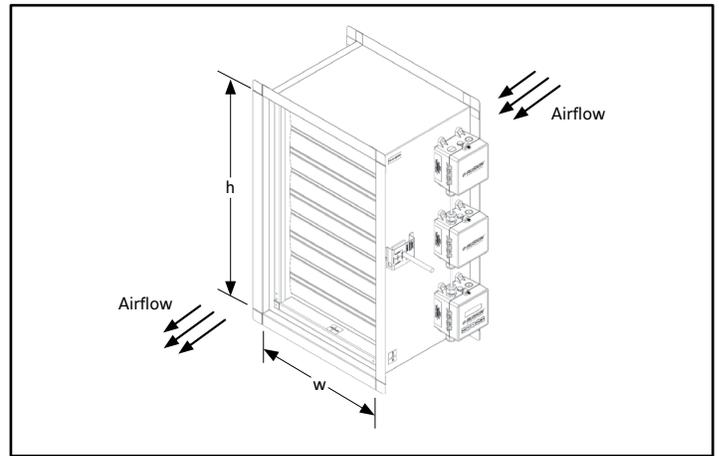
RIGHT HAND Mount Airflow enters through the TDP05K probes and exits through the control damper.
